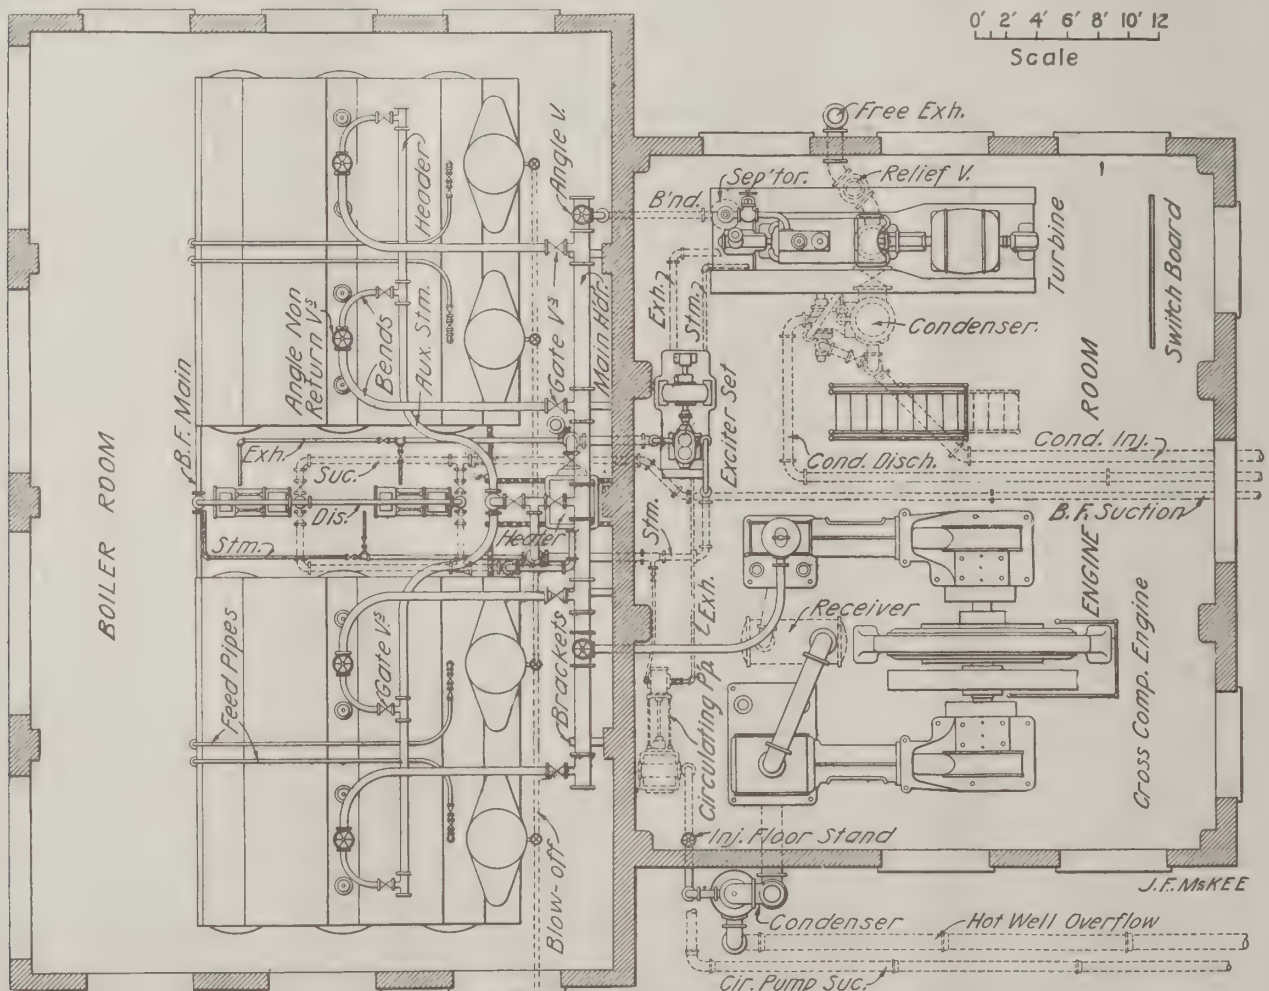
PLAN OF POWER PLANT UNDER DISCUSSION.
